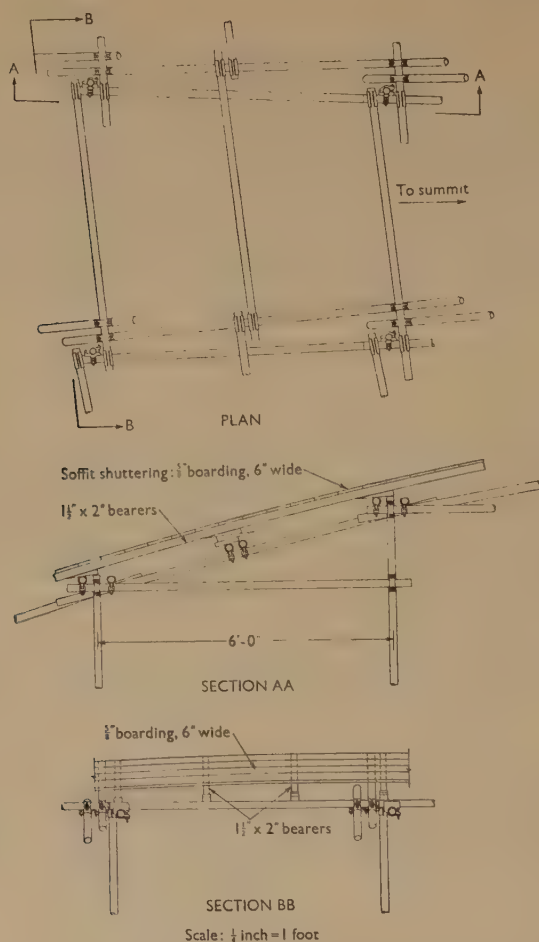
TYPICAL ARRANGEMENT OF SCAFFOLDING
